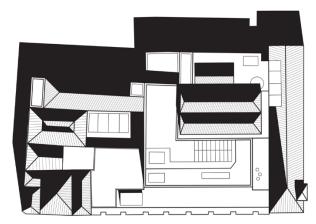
Roofplan of Leiden (made by façade&roof scale group).
